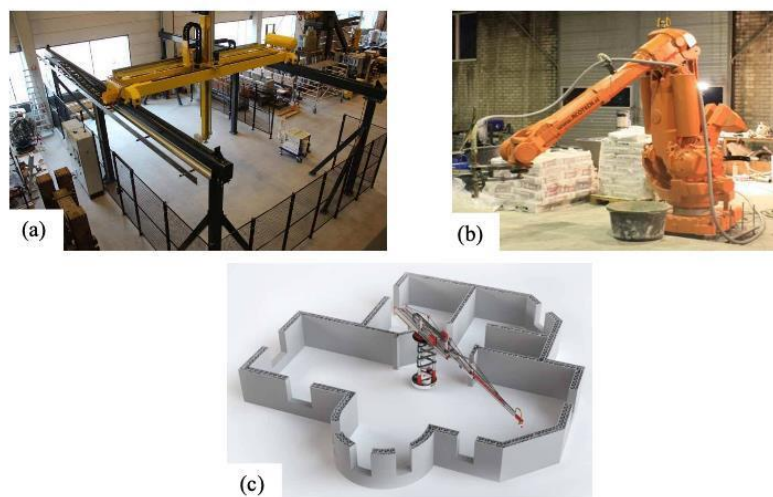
(a) 4 Axis gantry printer (b) 6 axis robotic printer (c) Crane printer [35].
